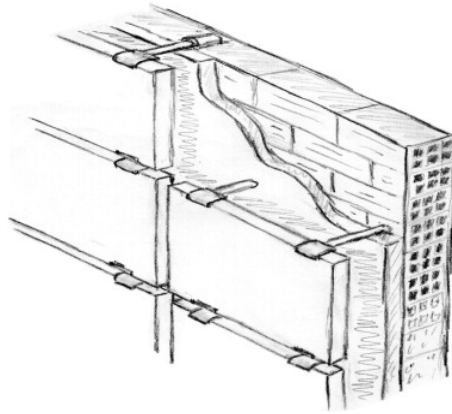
The Open Joint Ventilated Façade (Sanjuan et al., 2011b).
